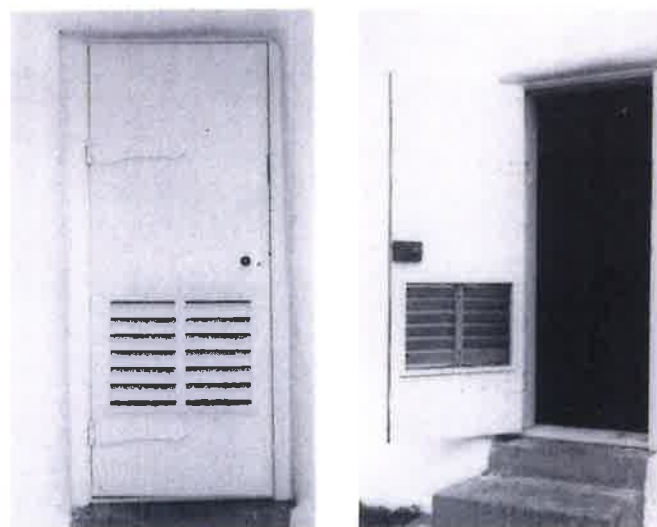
If historic doors would be damaged by adding extra locks, they should be removed and stored and new security doors added. At this lighthouse, the historic door has been replaced with a new door (seen both inside and outside) with an inset vent and new deadbolt locks. The heavy historic hinges have not been damaged. Photo: Williamsport Preservation Training Center, NPS.
